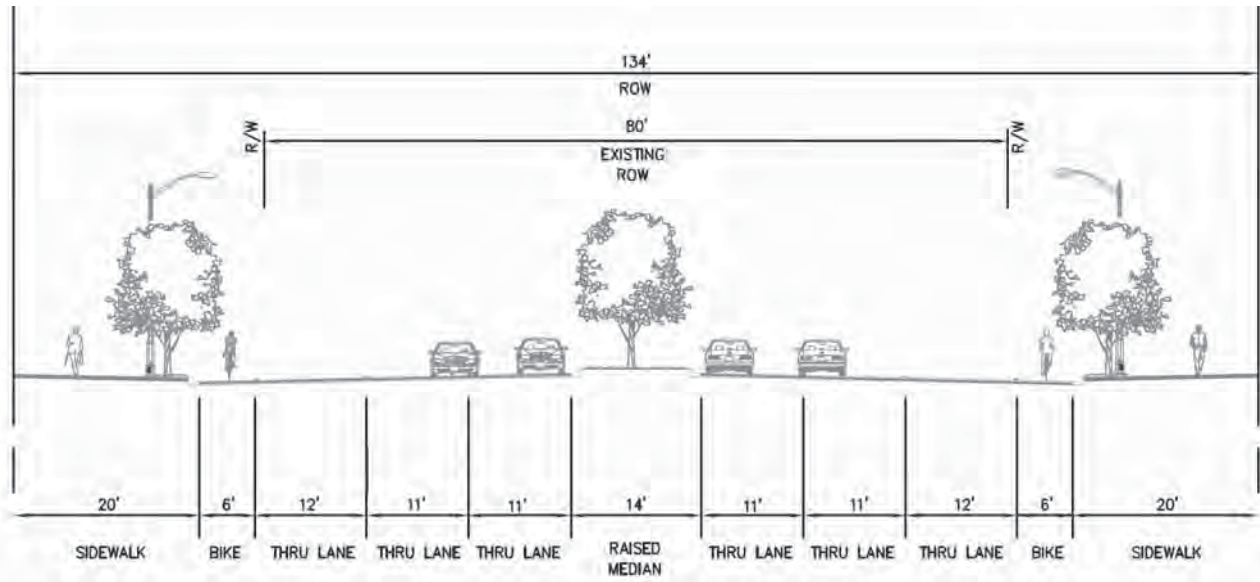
Proposed Cross Section, H Street Between Broadway and I-5
